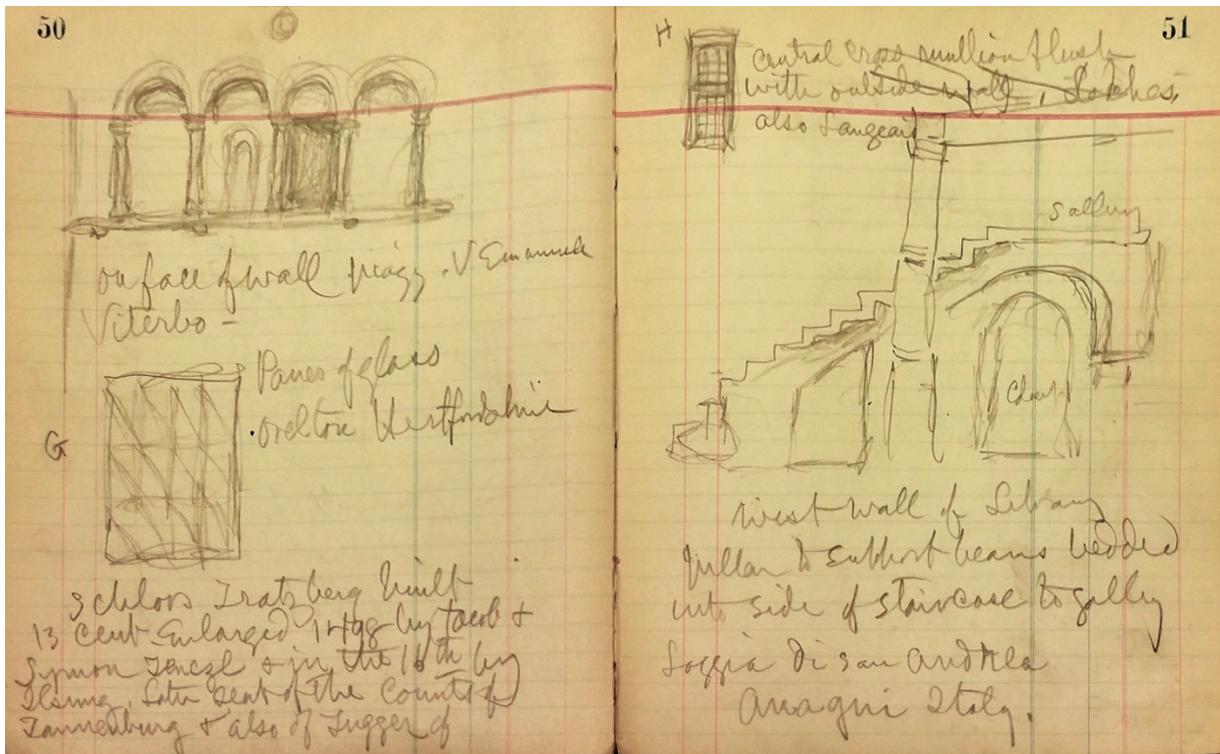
Interior elevation: stair in "Saloon" room. Text reads: "West wall of Library pillar to support beams bedded into side of staircase to gallery Loggia di San Andrea Anagni Italy." Image: courtesy of the Mercer Museum Research Library.
